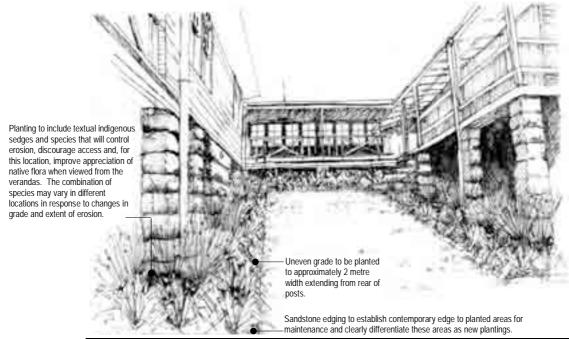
SKETCH VIEW OF PROPOSED INDIGENOUS PLANTING TO ELEVATED BUILDINGS ON ESCARPMENT SIDE OF FIRST CLASS
